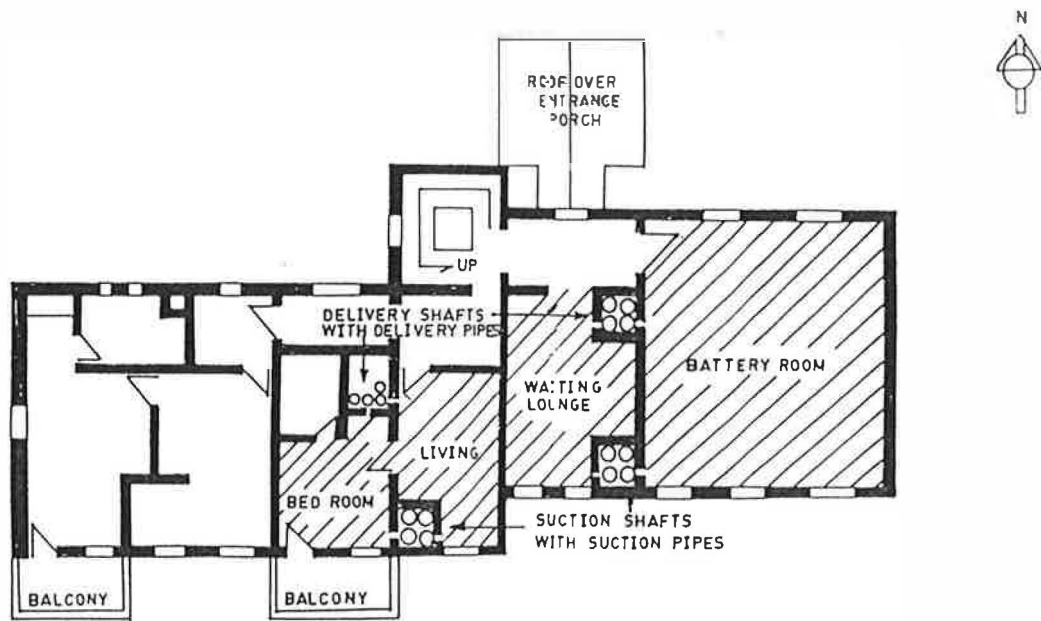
Portions of the building airconditioned by the system on the first floor.
